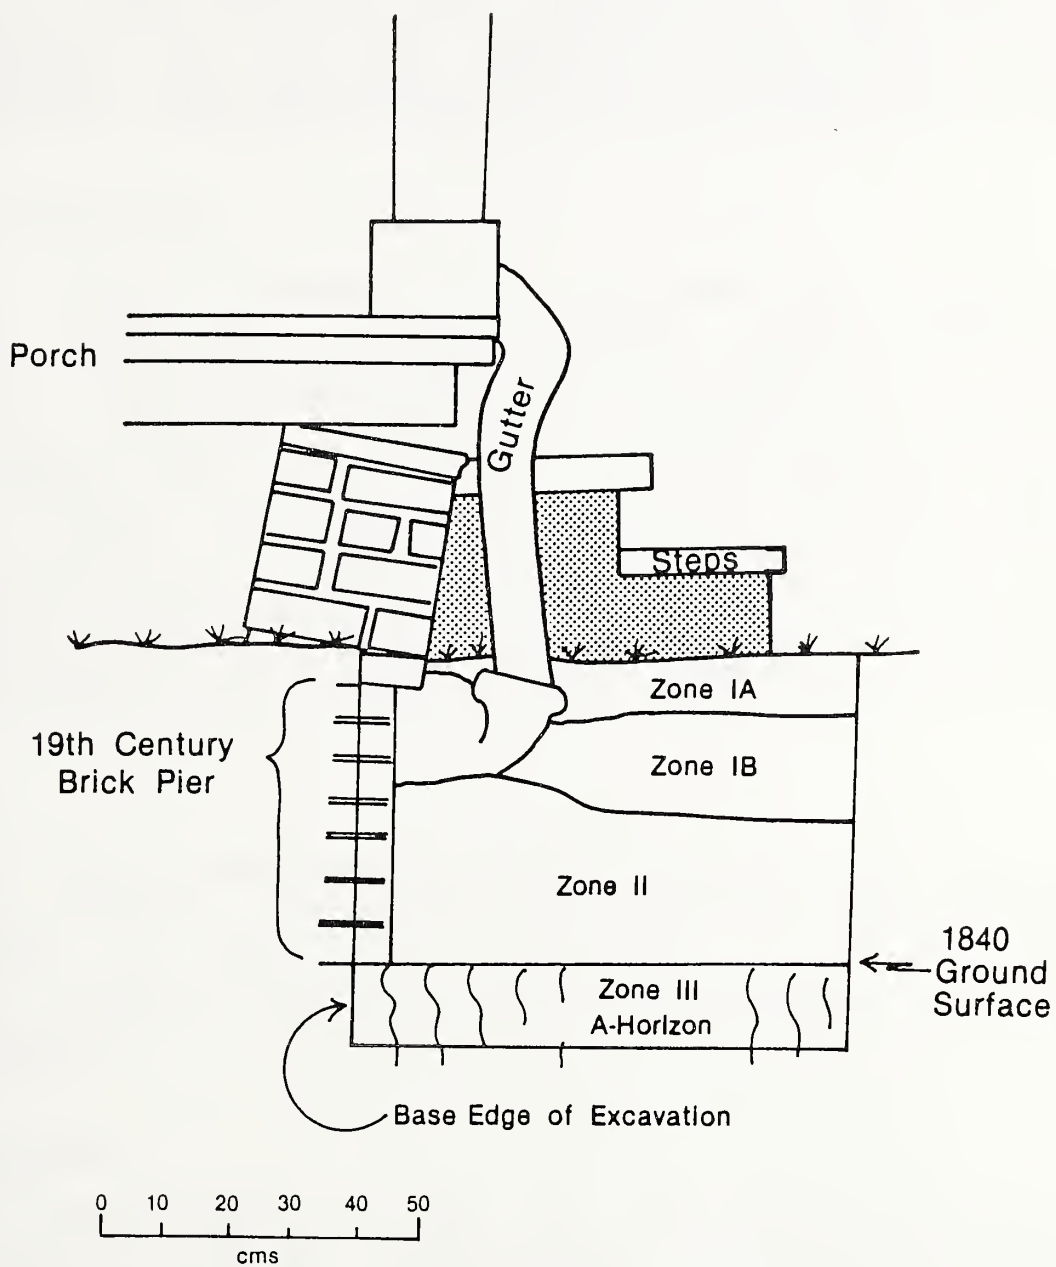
Lincoln Site, Test 9, North Wall Profile.
